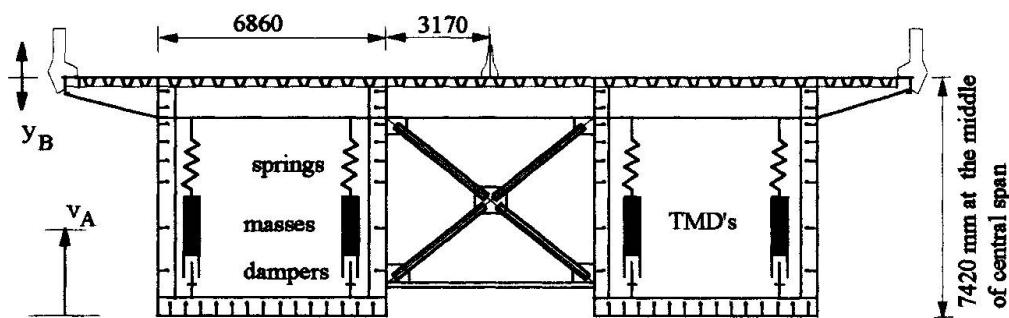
Typical Cross Section with Tuned-Mass-Dampers located in the middle of central span
